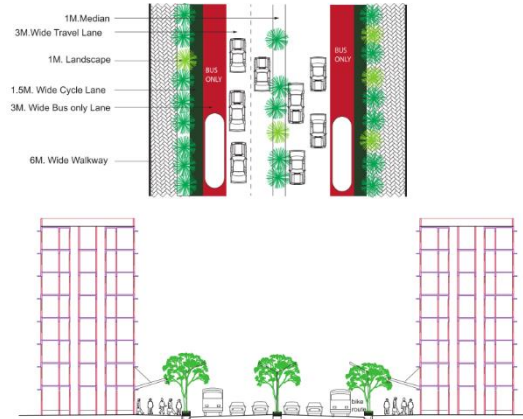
Schematic Street Section – 36m wide Arterial Roads
